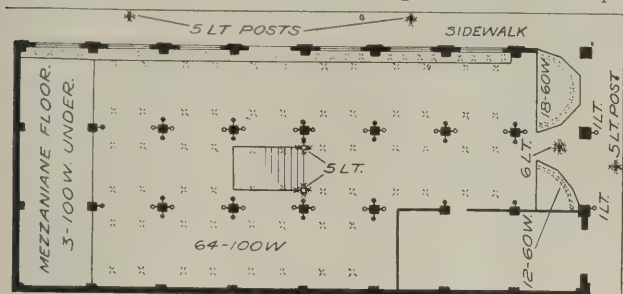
STREET FLOOR PLAN OF NEW PHOENIX BUILDING, SHOWING ARRANGEMENT OF LIGHTING UNITS AND FANS.
